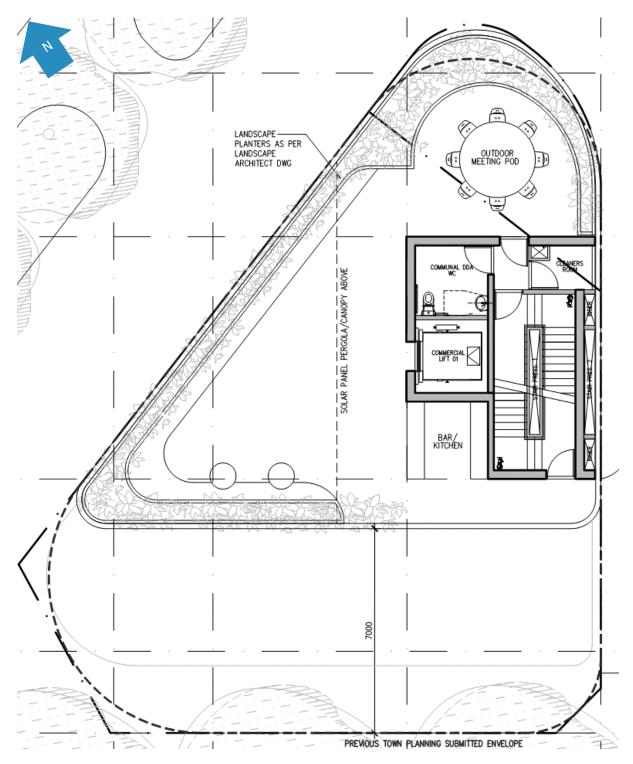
Proposed Floor Plans – Rooftop Plan (Image Source: Elenberg Fraser)
